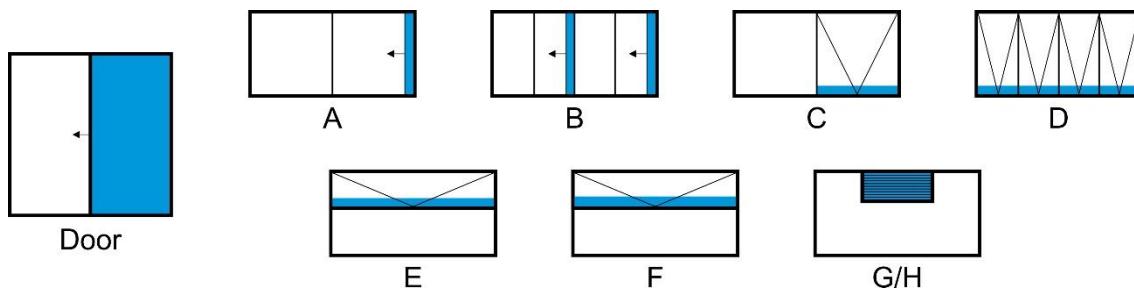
Typical Balcony Door Frame Size of 2.4m×2.4m Frame Size (Door) and Typical 2nd Opening Types for a 2.4m×1.2m Overall Frame Size (A-H)
